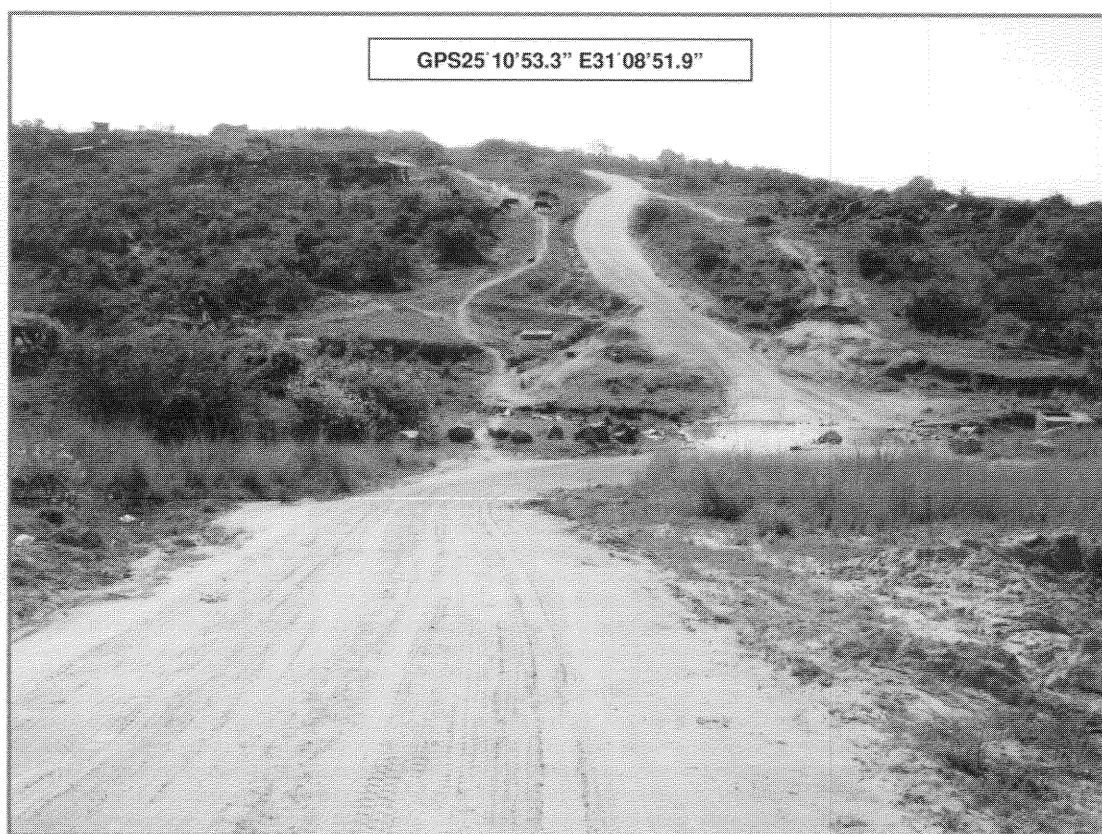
View of Nsikanzi River where the proposed bridge will be constructed.
